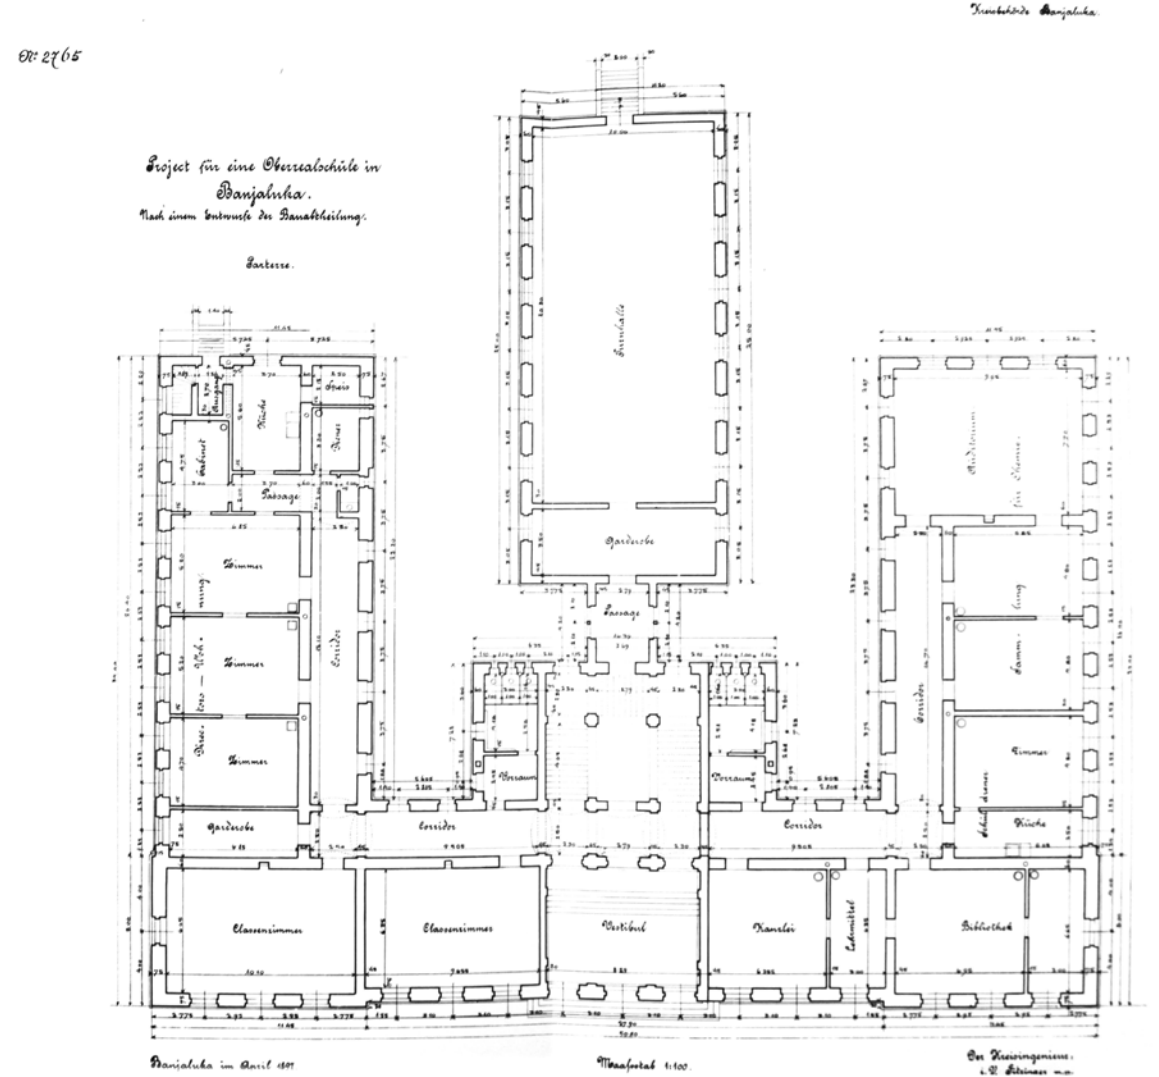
Real Gymnasium in Banja Luka; ground floor plan.
